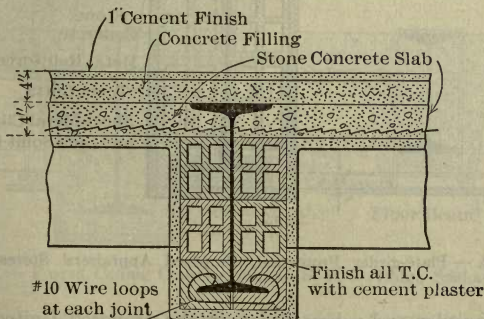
Concrete Floor Slabs with Terra-cotta Girder Casing, U. S. Assay Office, N. Y.
